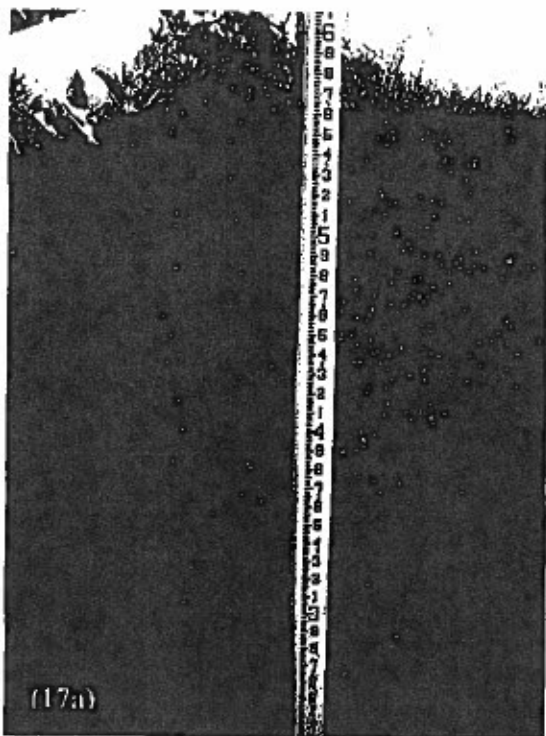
Vertical cracks were noted in the left and right concrete wing walls. (Left wing wall shown) (17b.) Vegetation was also noted growing between numerous cracks found in the spillway's concrete apron.
